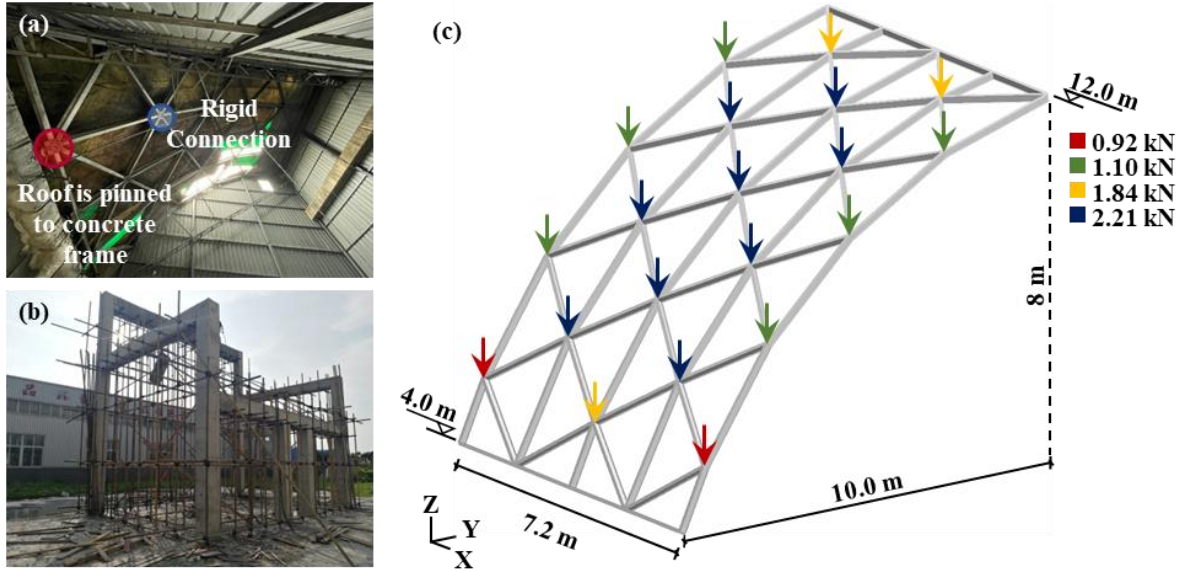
Details of the test structure: (a) connection classifications; (b) supporting concrete frame; and (c) dimensions and imposed load.
